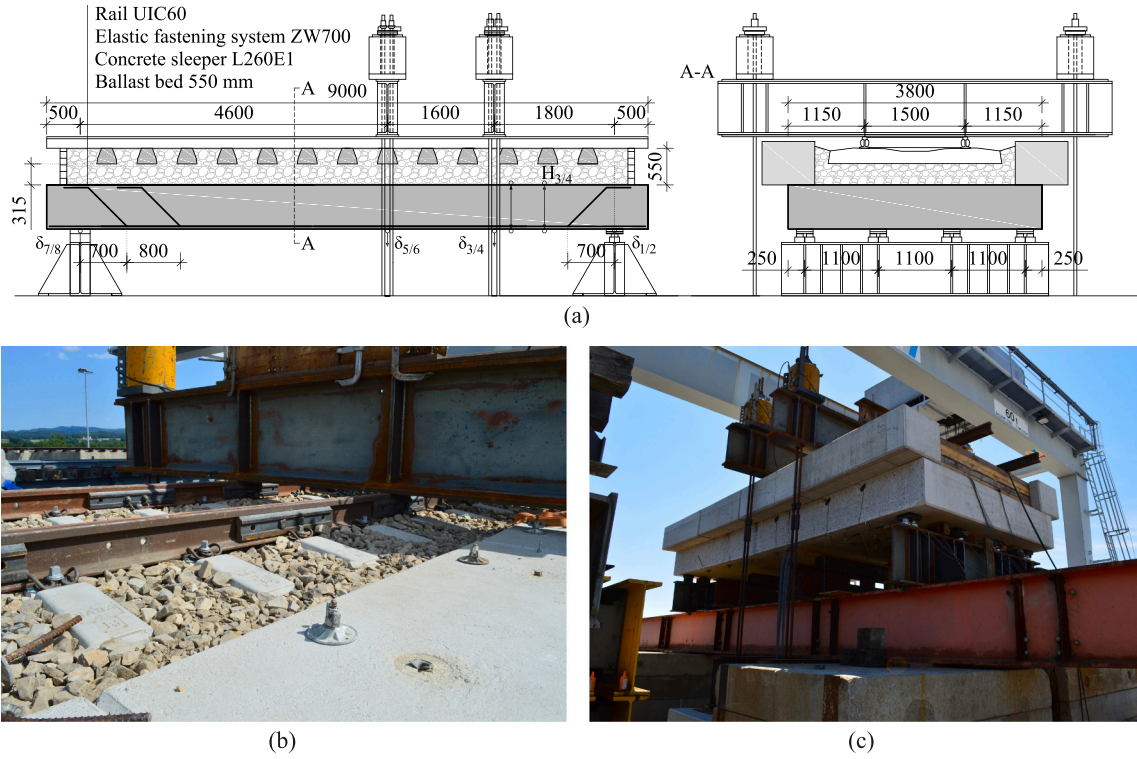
Testing of the slab with superstructure: (a) load arrangement and layers of the superstructure; (b) reinforced load introduction point and mounted edge beam; (c) test setup.
